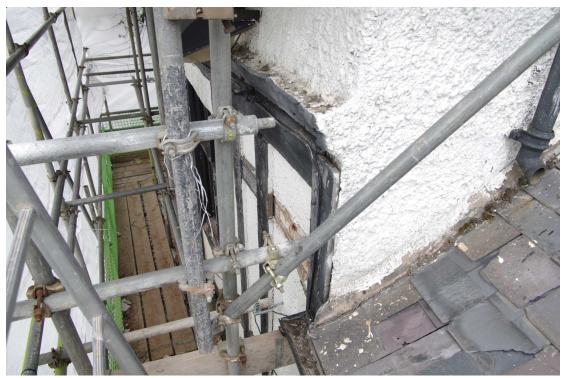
South facing elevation at first floor level Looking north-west. Note moulded brick string course above window
